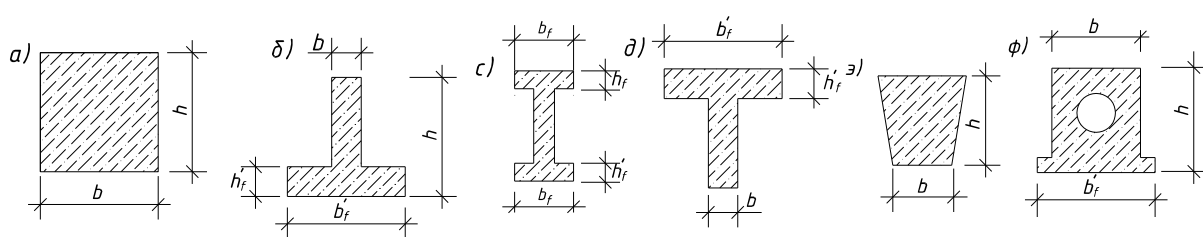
Cross-sectional surfaces of reinforced concrete beams.
